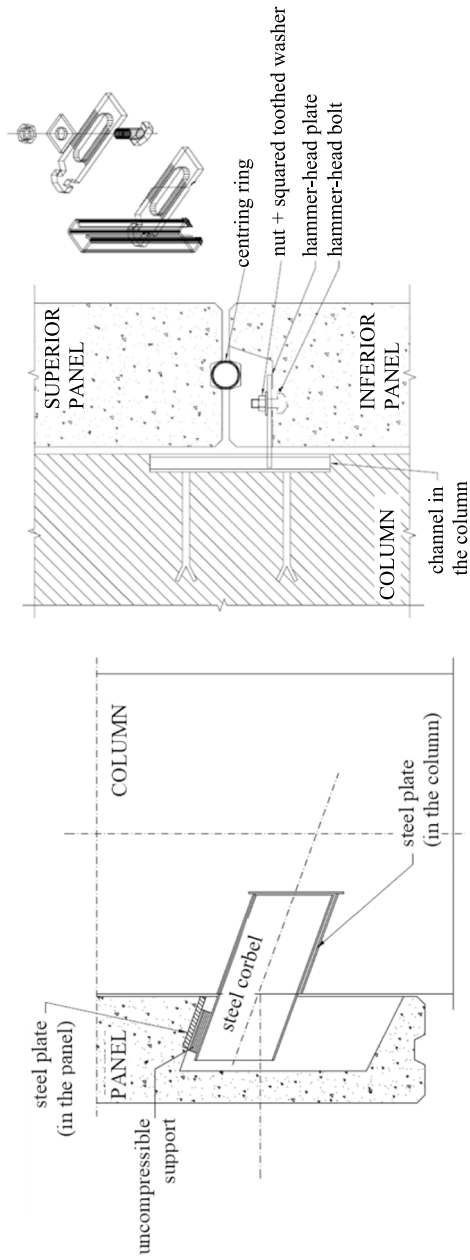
Schemes of two typical connections for horizontal cladding panels, a adapted from Reluis Report (2007); connection adopted for a The (h1) frame class and For the (h2) frame class
